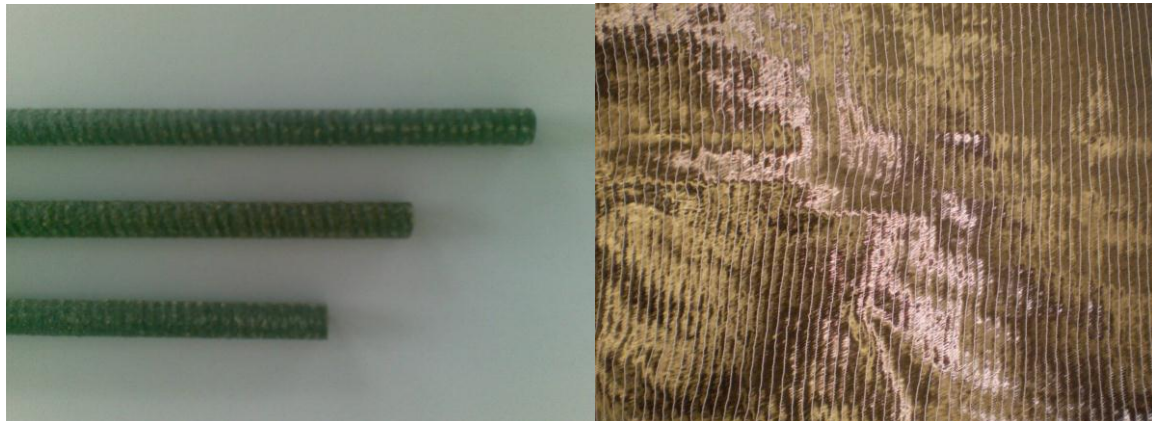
(Left) Sand coted BFRP rebars. (Right) Basalt sheets
